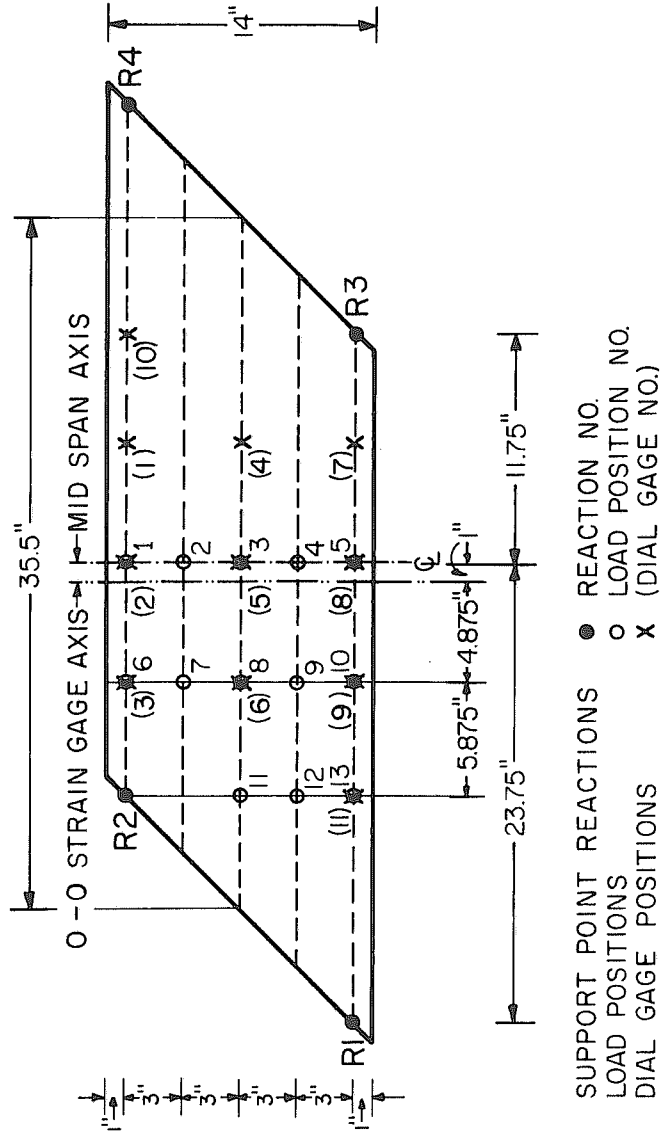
SKEW BOX GIRDER BRIDGE MODEL NO.3,
